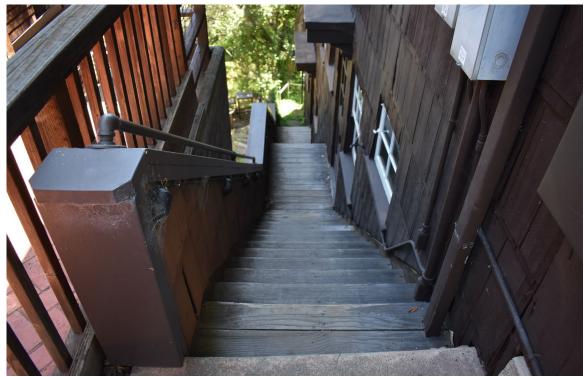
214 Hillcrest Road - Claremont Club\_Berkeley\_CA\_Photo\_0028. SITE VIEW: Wood-frame staircase along the eastern façade, view south.
